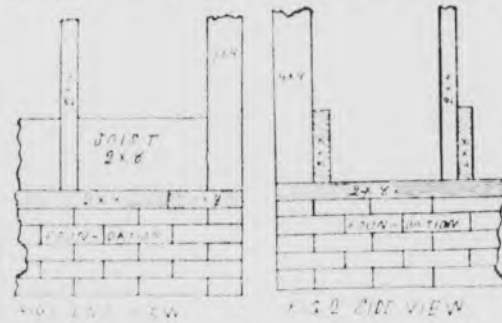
, end view, and Fig. 2, side view, show a method of framing sills by laying joists flat on the wall. Fig. 2 shows how to space the joists and studding, so that they may be spiked together and also to the sill. This method brings the corner joist right to receive the flooring as will be seen by referring to the sketch. If the timbers are all thoroughly spiked this method will be found to make a good strong frame and with but little expense either in material or labor.
